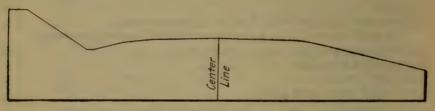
Transparent Templet for Use on Cross-Sections Giving Finished Shape of Road
